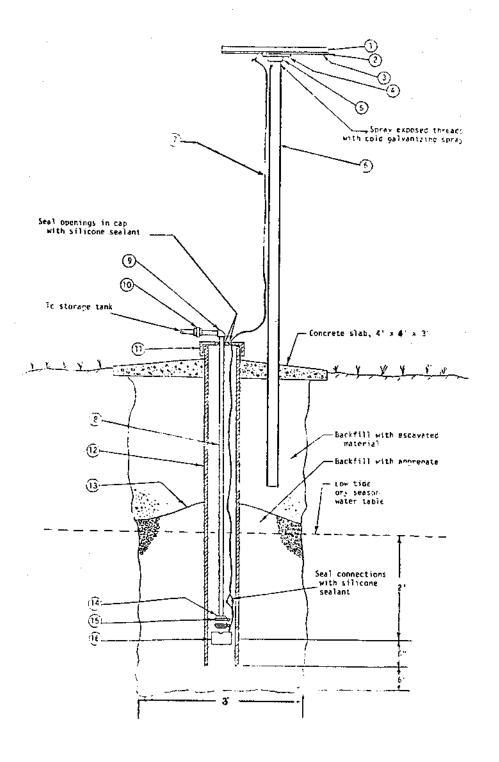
Assembly drawing of the "WERI Well." (not to scale)
